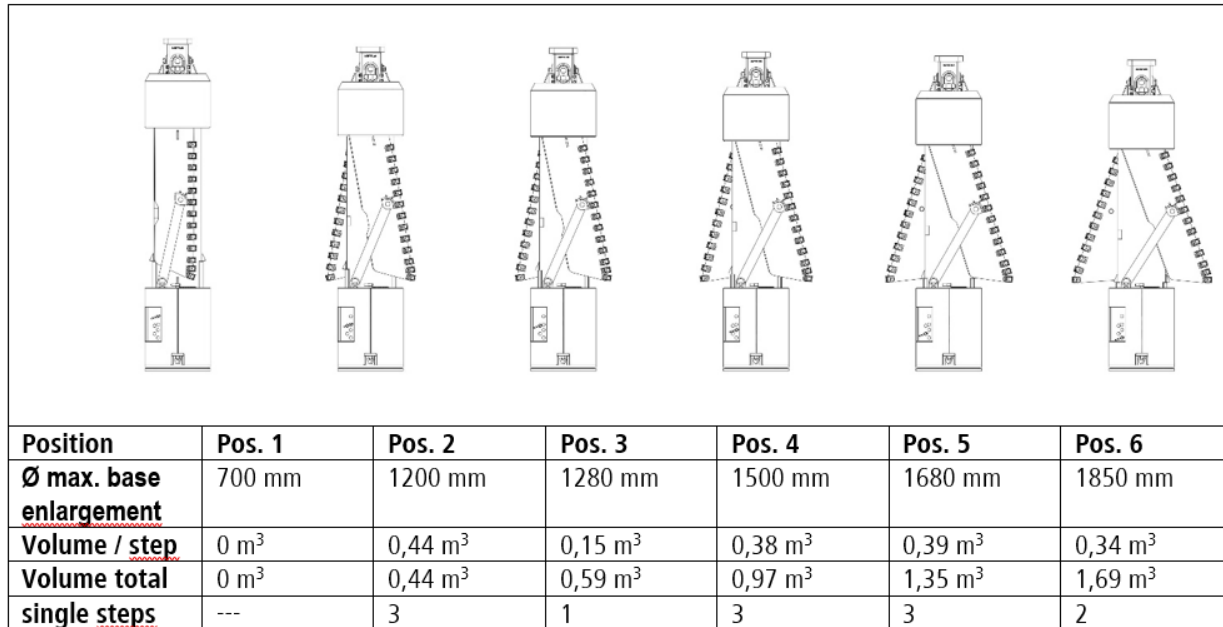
Drilling tool for base enlargement Onyx, Geneva (courtesy of Hartfuss Stahlbau GmbH)
